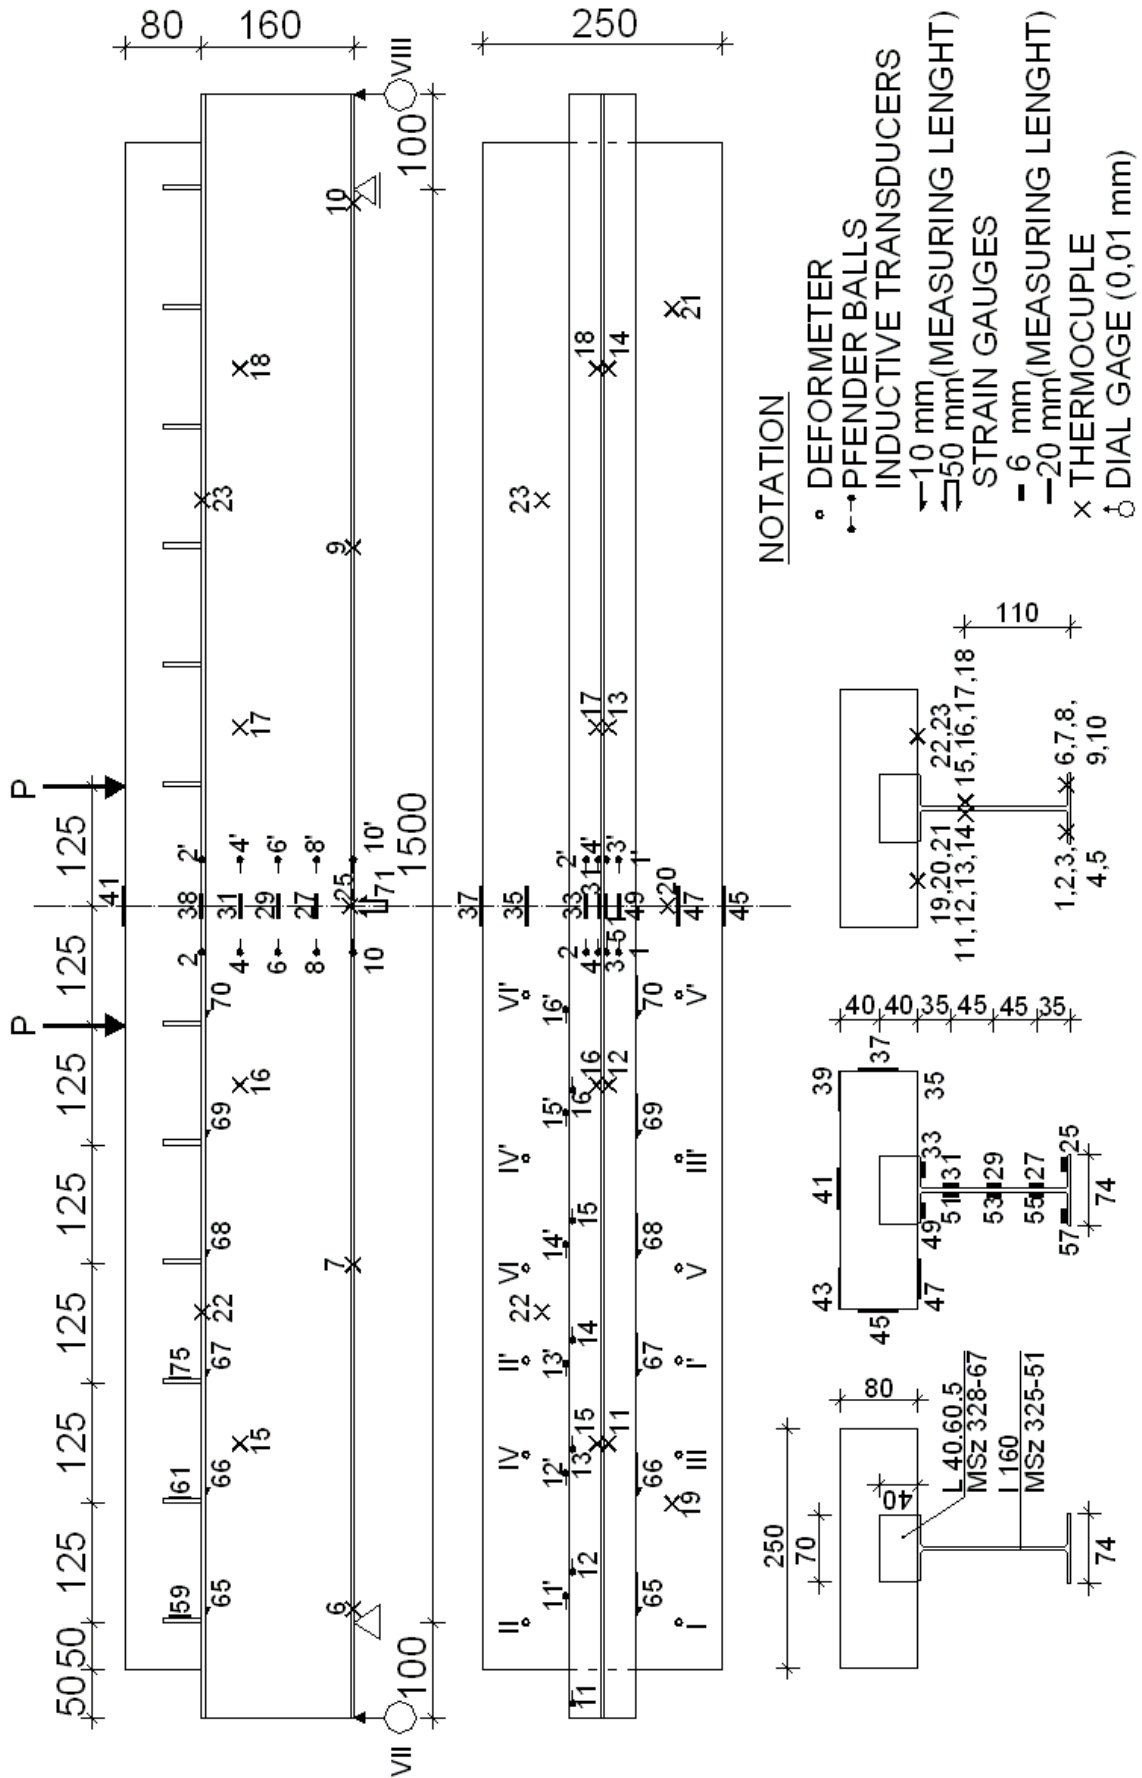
The dimensions, measuring points and instrumentation of Specimen S2. Measures in millimetres.
